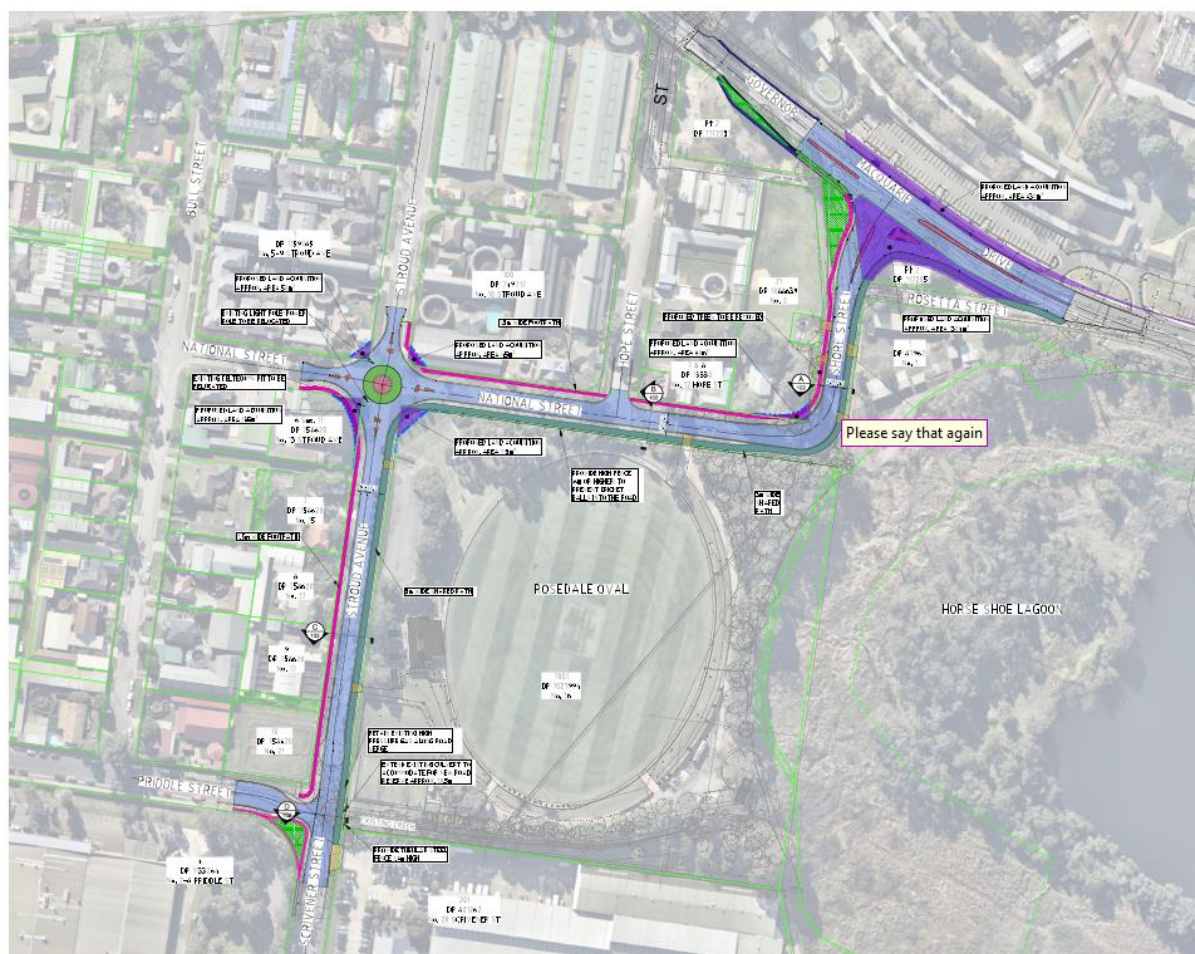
Alternative route for Manning Street bypass via existing roads: Stroud Avenue, National Street and Shore Street.
